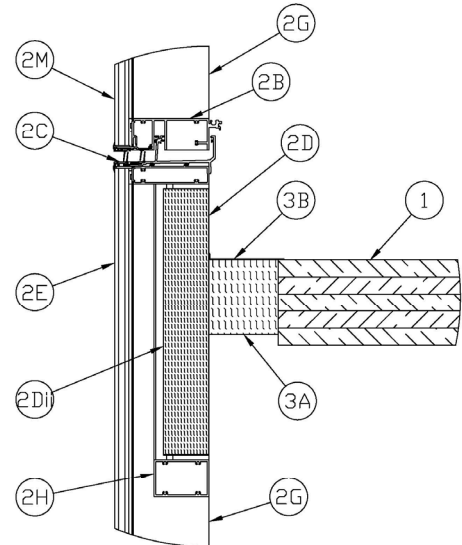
Base Detail Between Anchors (Intermediate Transom)
